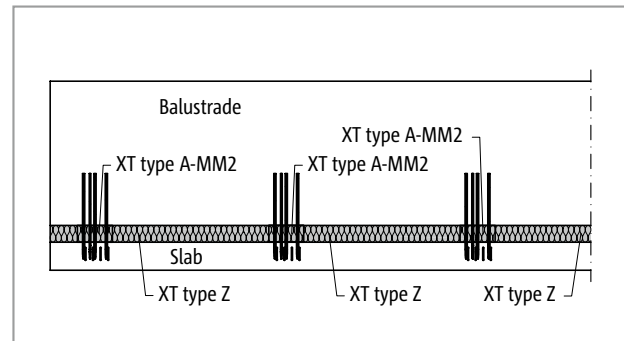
Schöck Isokorb® XT type A, Z: Parapet (XT type A-MM2)
